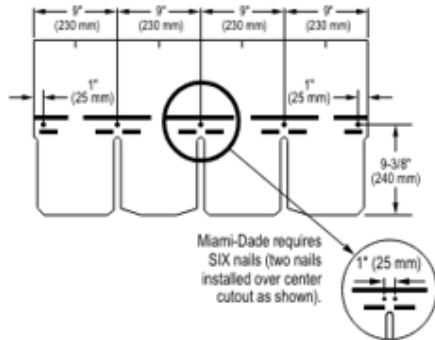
Use FIVE nails for every Highland Slate® shingle.
